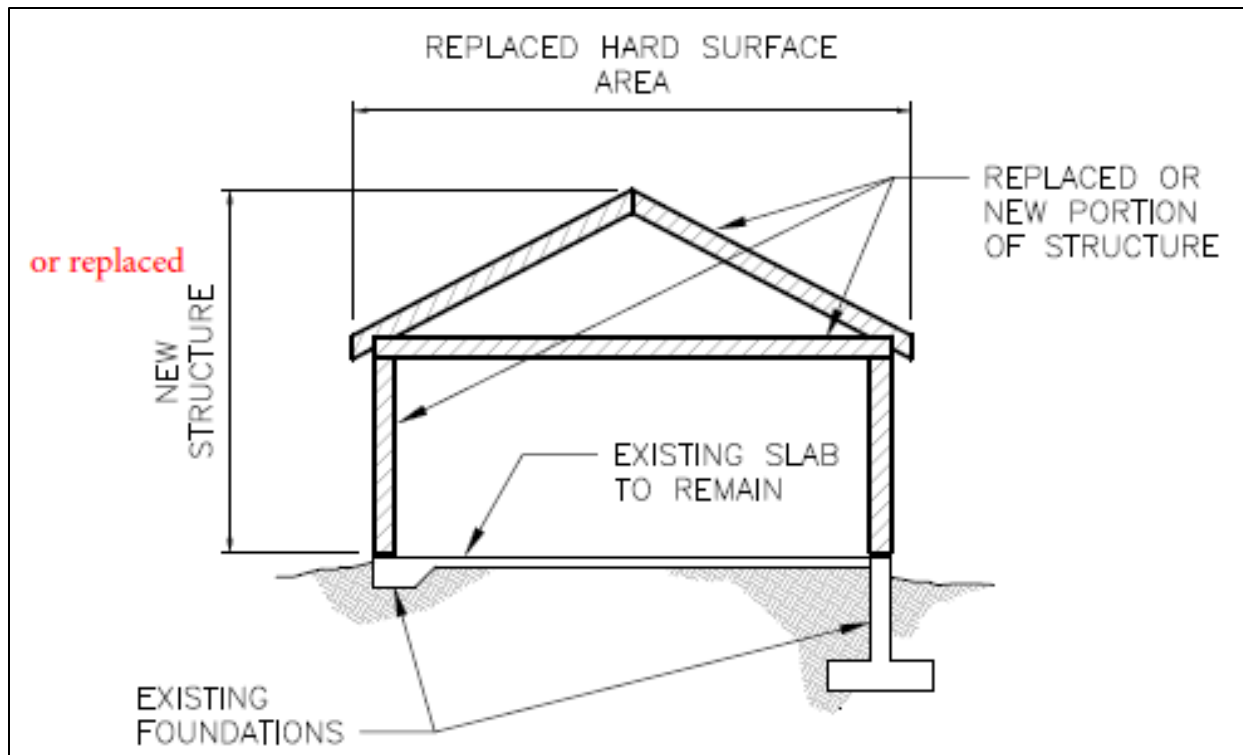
Example of Replaced Hard Surface – Structure Removed Down to Slab on Grade/Footings. (New Figure)
